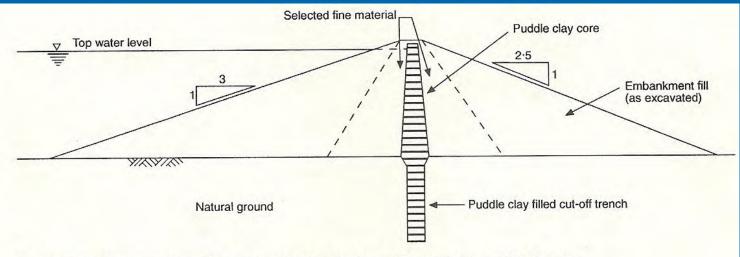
Typical cross-section of an old embankment dam with a central puddle clay core
